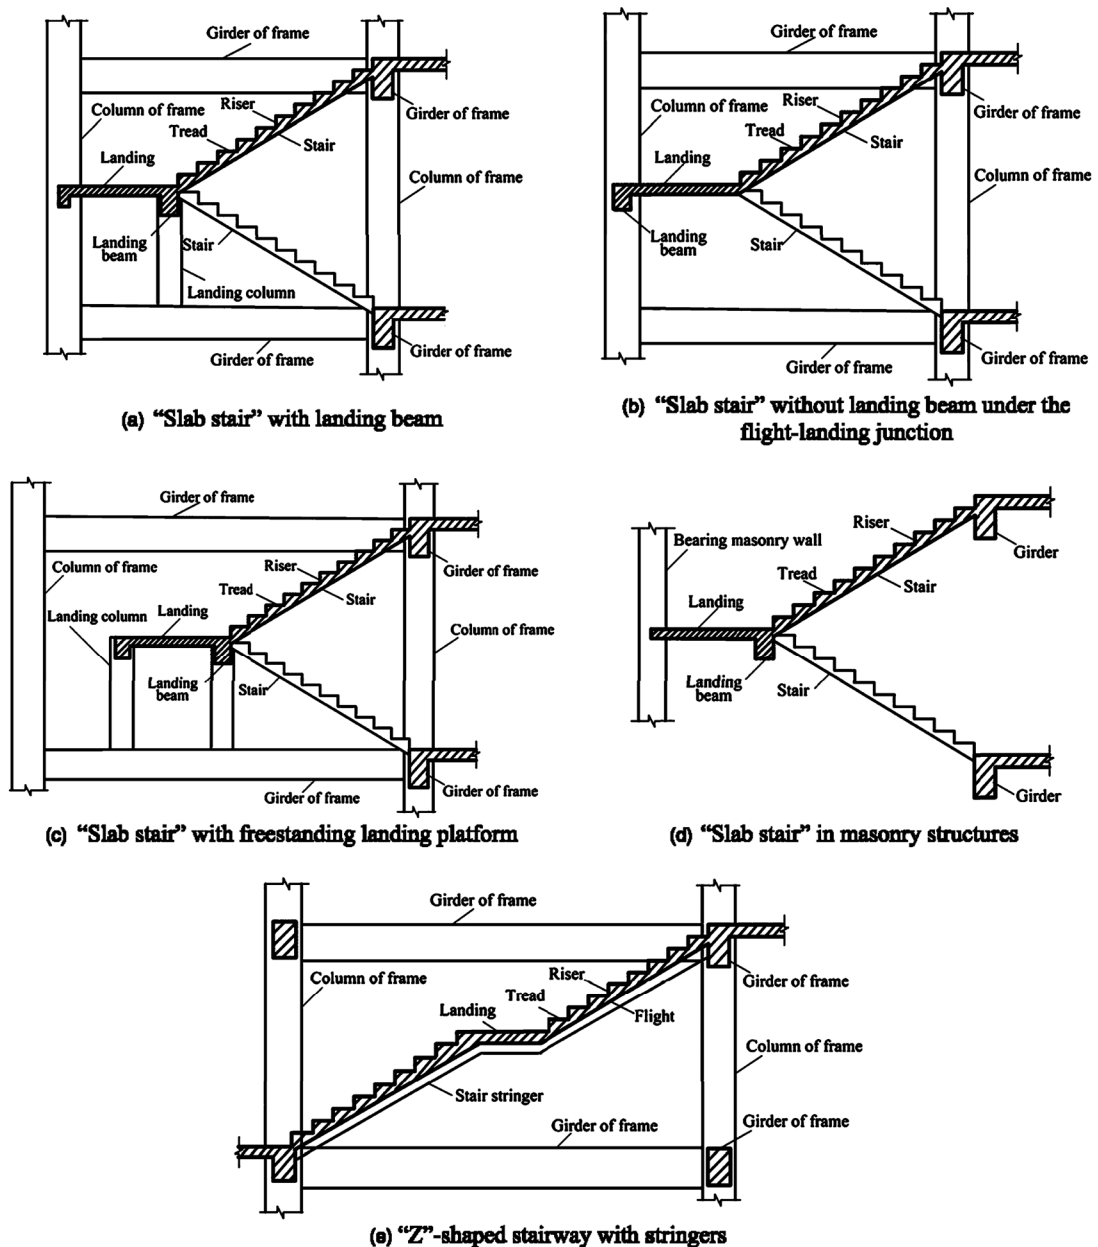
Typical stairway configurations in Wenchuan earthquake area: (a) slab stair with landing beam; (b) slab stair without landing beam under the flight-landing junction; (c) slab stair with freestanding landing platform; (d) slab stair in masonry structures; (e) Z-shaped stairway with stringers
